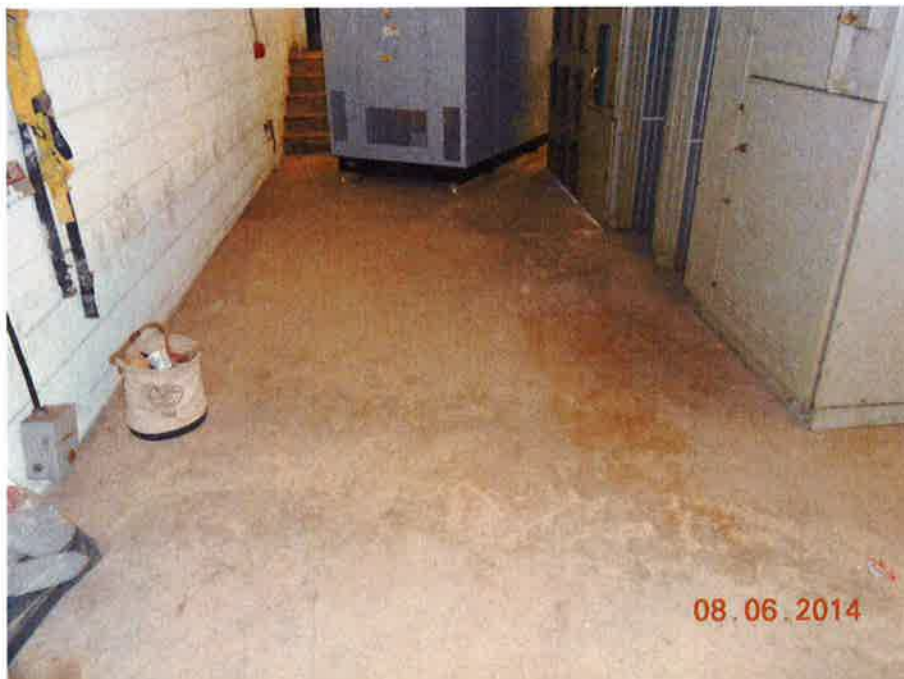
Transformer No. 3475168 prior to PCB oil removal.
